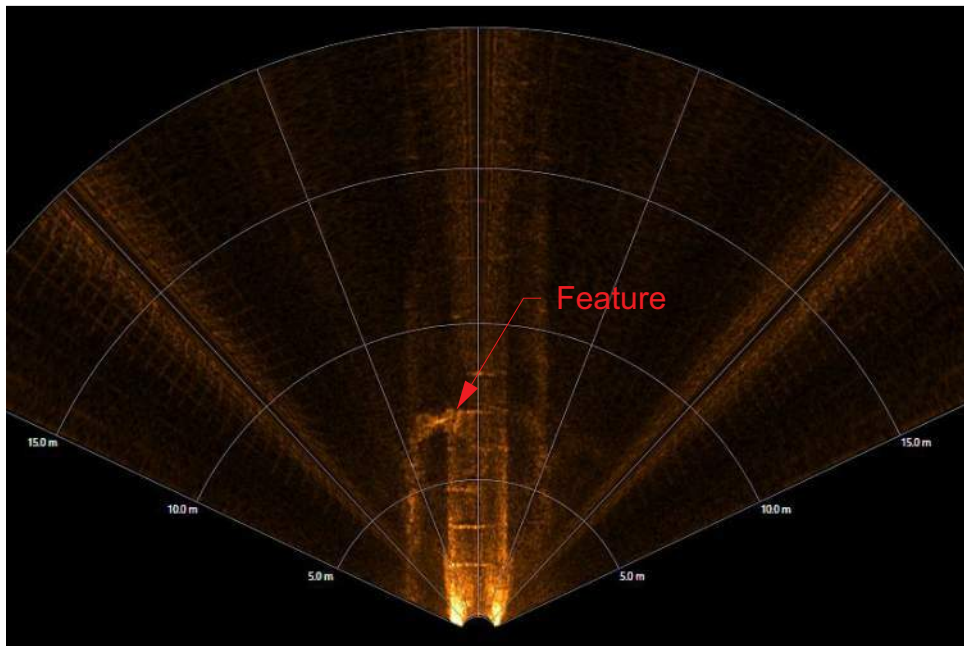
Sonar image at 635 feet downstream of Access Point 1. Feature on tunnel left 25 feet ahead.
